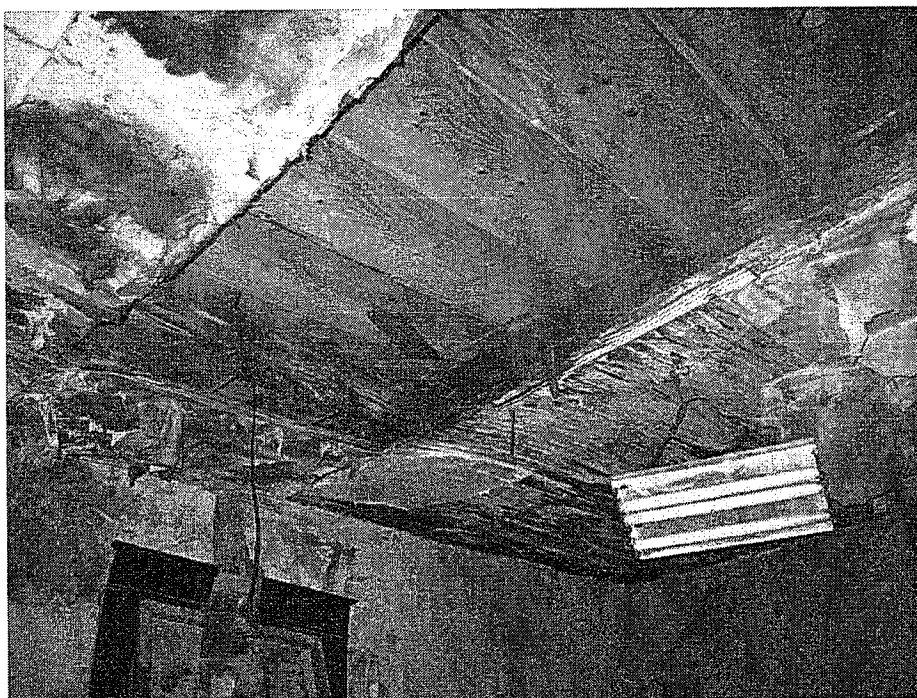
Deterioration of bearing ends of site built wood roof truss.
